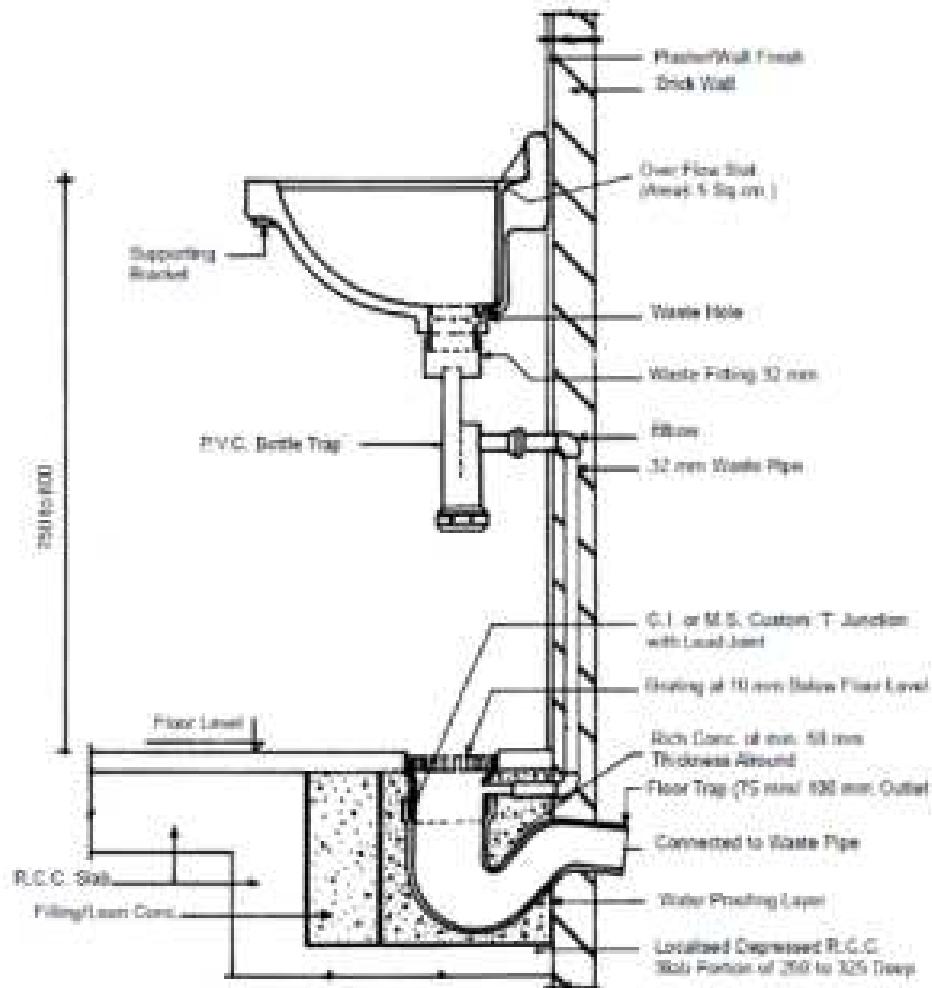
Typical Vertical Section of Wash Basin (Waste Pipe Concealed from View)
